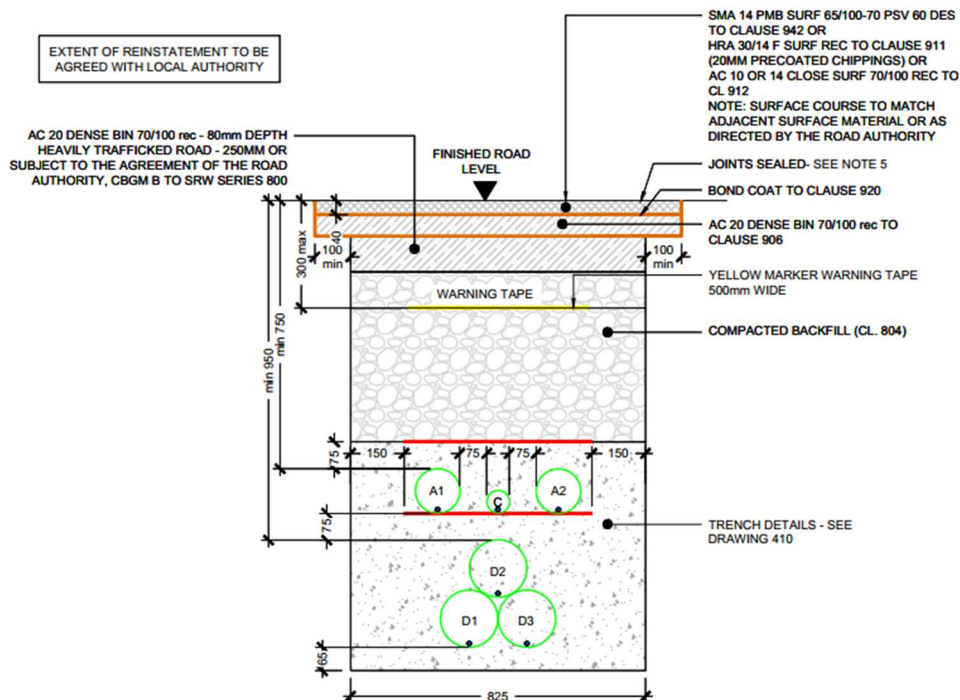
Typical Permanent Reinstatement of Longitudinal Opening in Roadway
